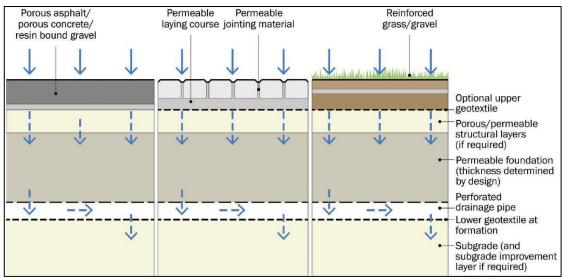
Detail of Type B Pervious Paving (CIRIA C753)
